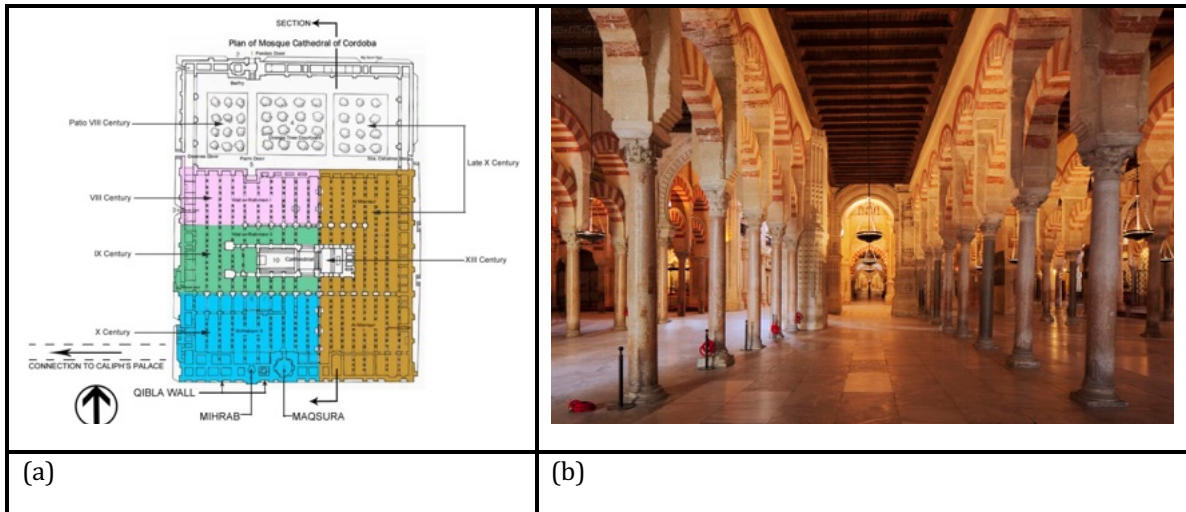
Floor Plan Showing Construction Stages (a); Column orders in the interior of The Córdoba Mosque - Cathedral (b)
